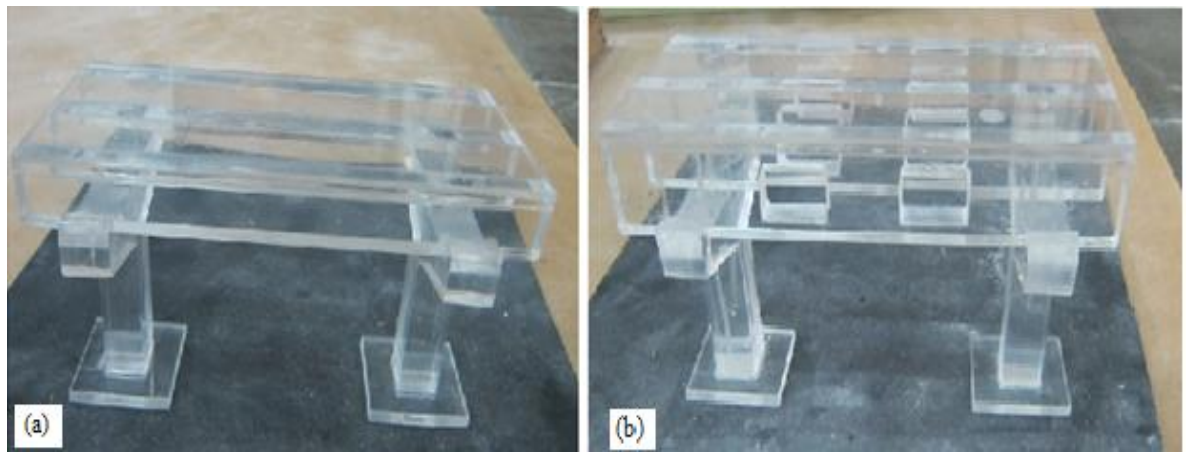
Photograph of the Bridge Model: (a) Solid girder bridge; (b) Perforated girder bridge
